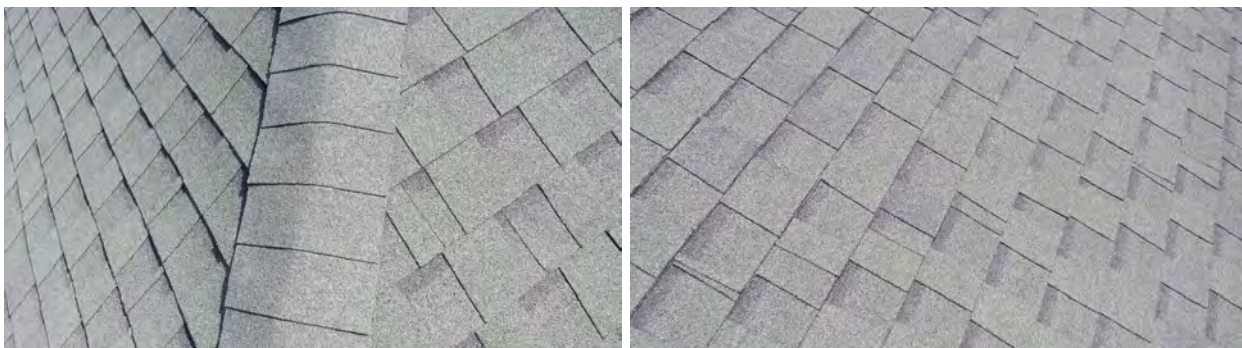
Roofing on the national child protection training center (8) with no hail damage.
